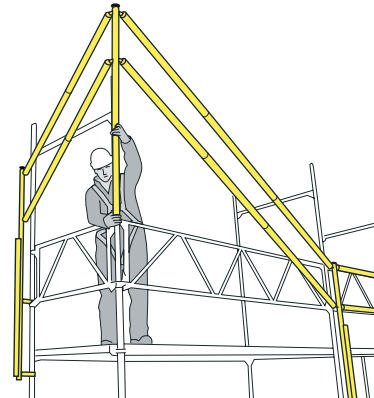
Tube and fitting Type Advanced Guardrail System
